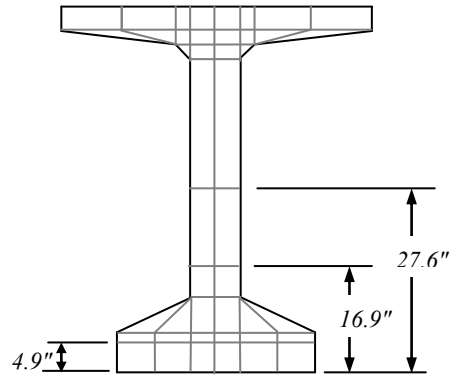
Computer model of the cross section of the girder neglecting prestressed steel
